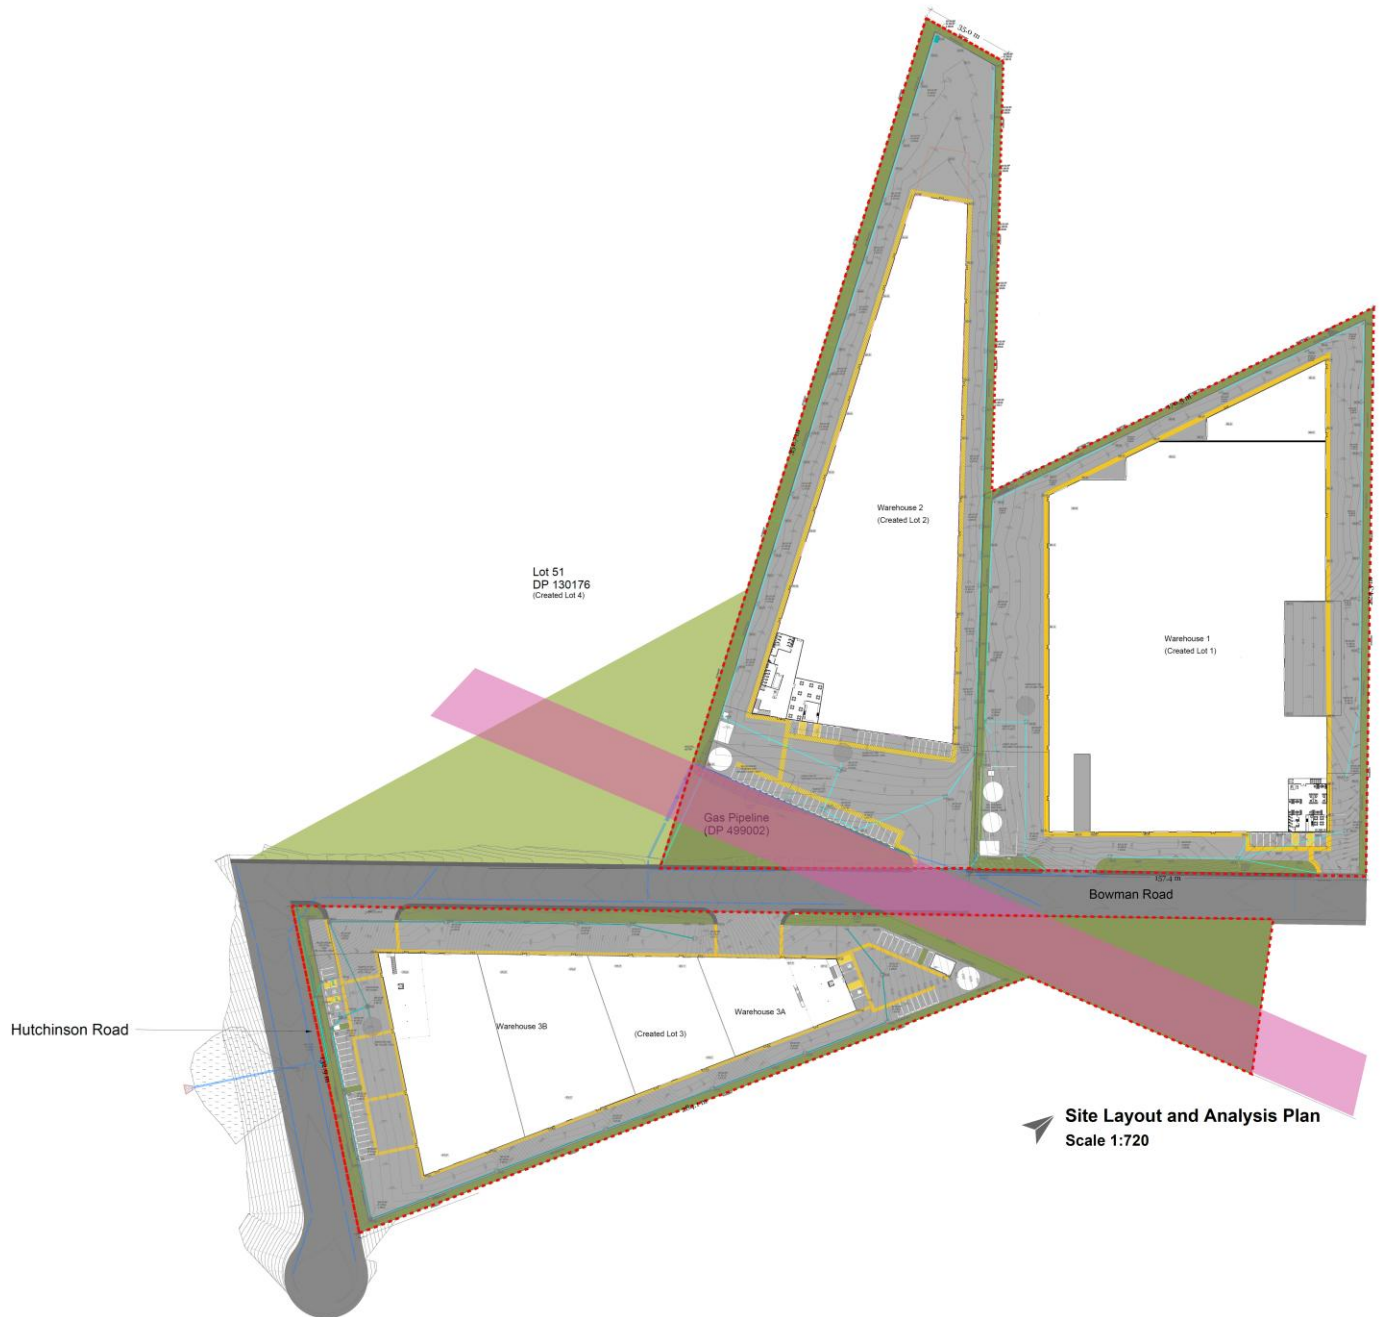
Proposed site plan within Warehouse 1 on Created Lot 1.
